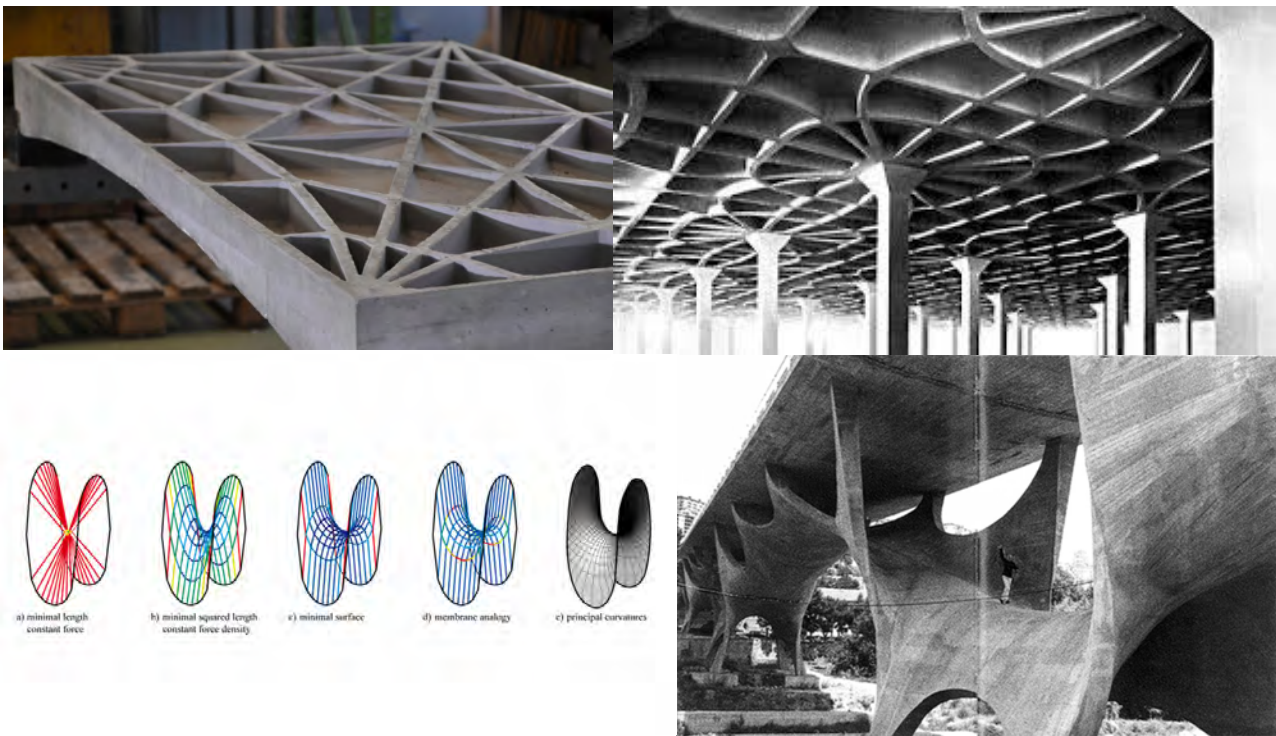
up-left: 3D-printed floor system by Block Research Group; up-right: Industrial warehouse “Lanificio Gatti” (1951-1953) by Pieri Luigi Nervi, structural concrete.
